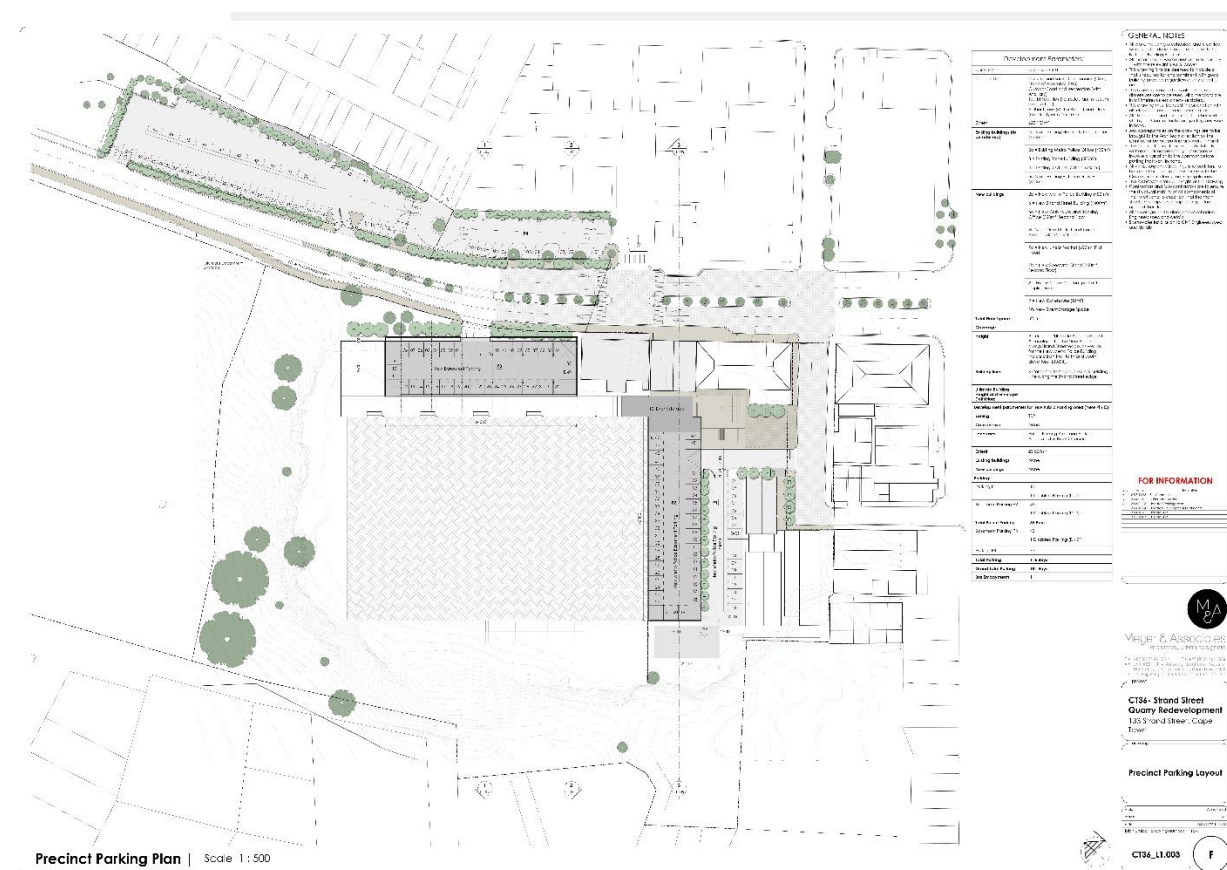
Parking on proposed redevelopment site (HHO, 2024)
